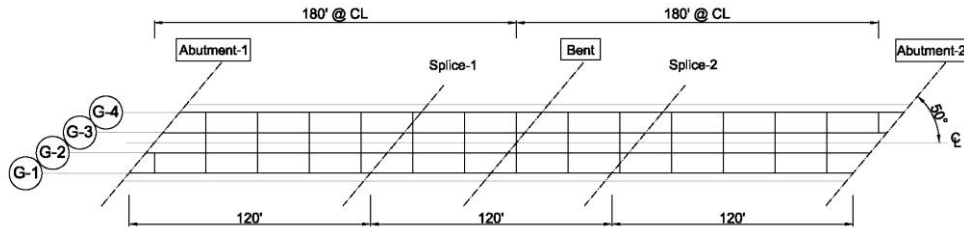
Simplified Framing Plan of Bridge S6: Two-Span, 50° Skew.
